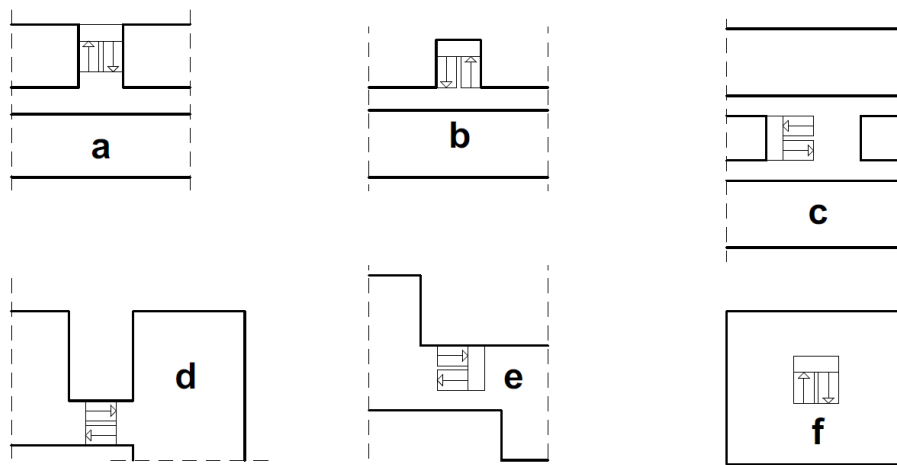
The location of the stairs in the building: a-c) middle corridor, d) level shift, e) connecting the wings of the building, f) centrally located
